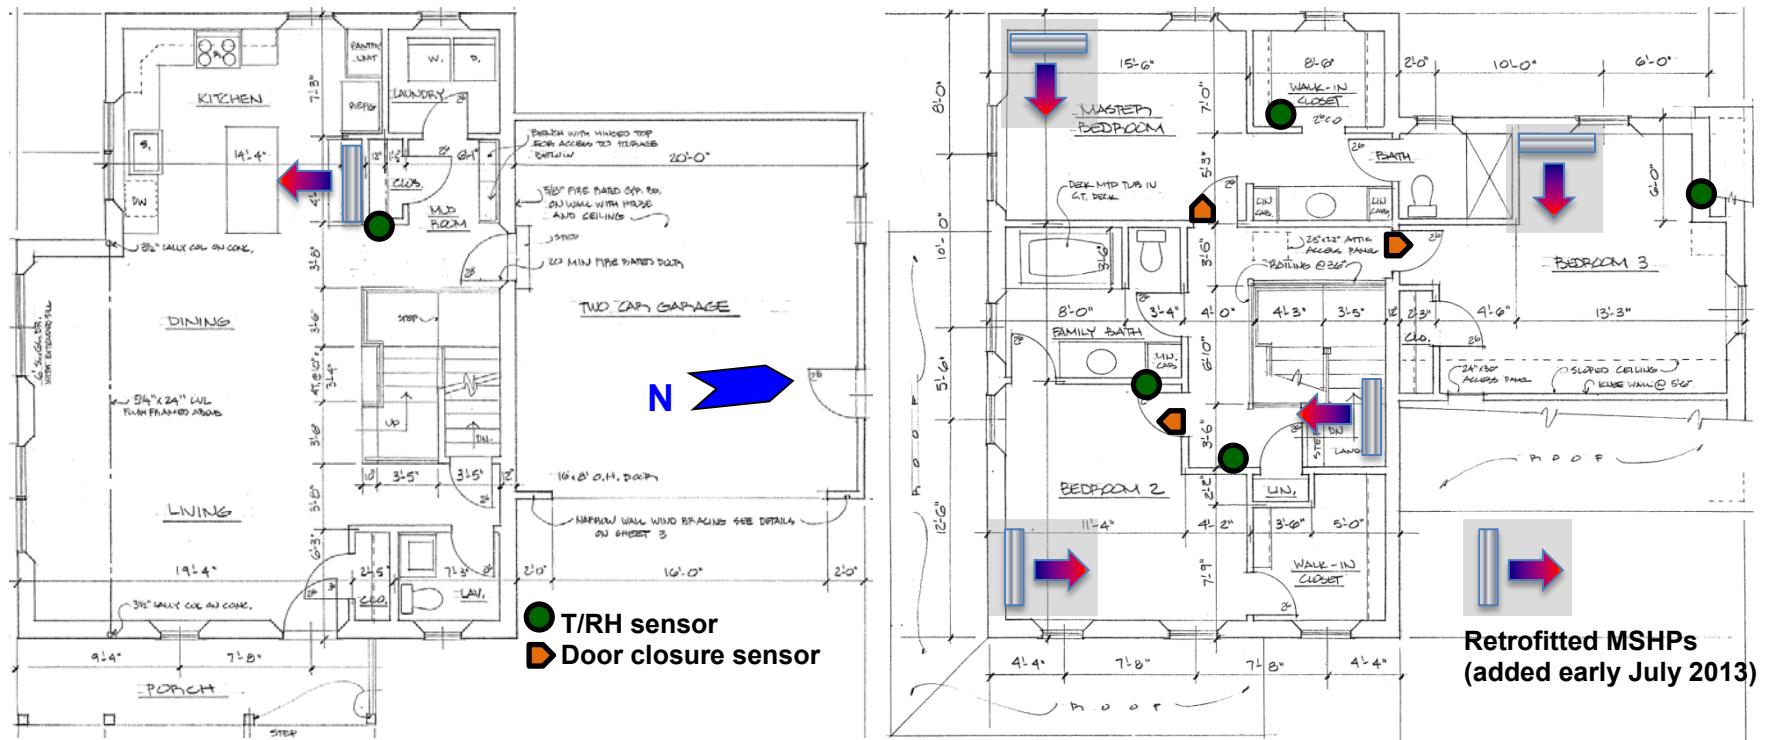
Easthampton Lot 30 floor plans, MSHP locations, monitoring locations
